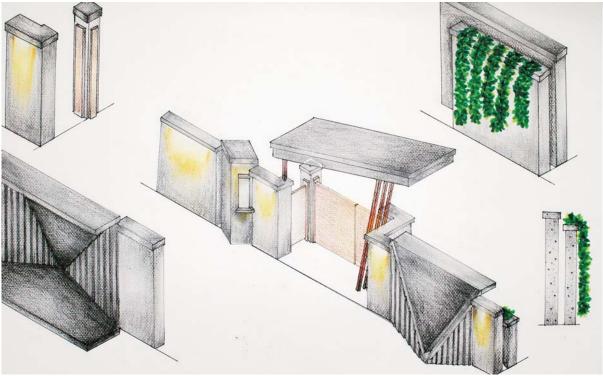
Transition from Basic Design to Architectural Design: Details of 'Boundary Wall' based on principles of Architect Tadao Ando.
